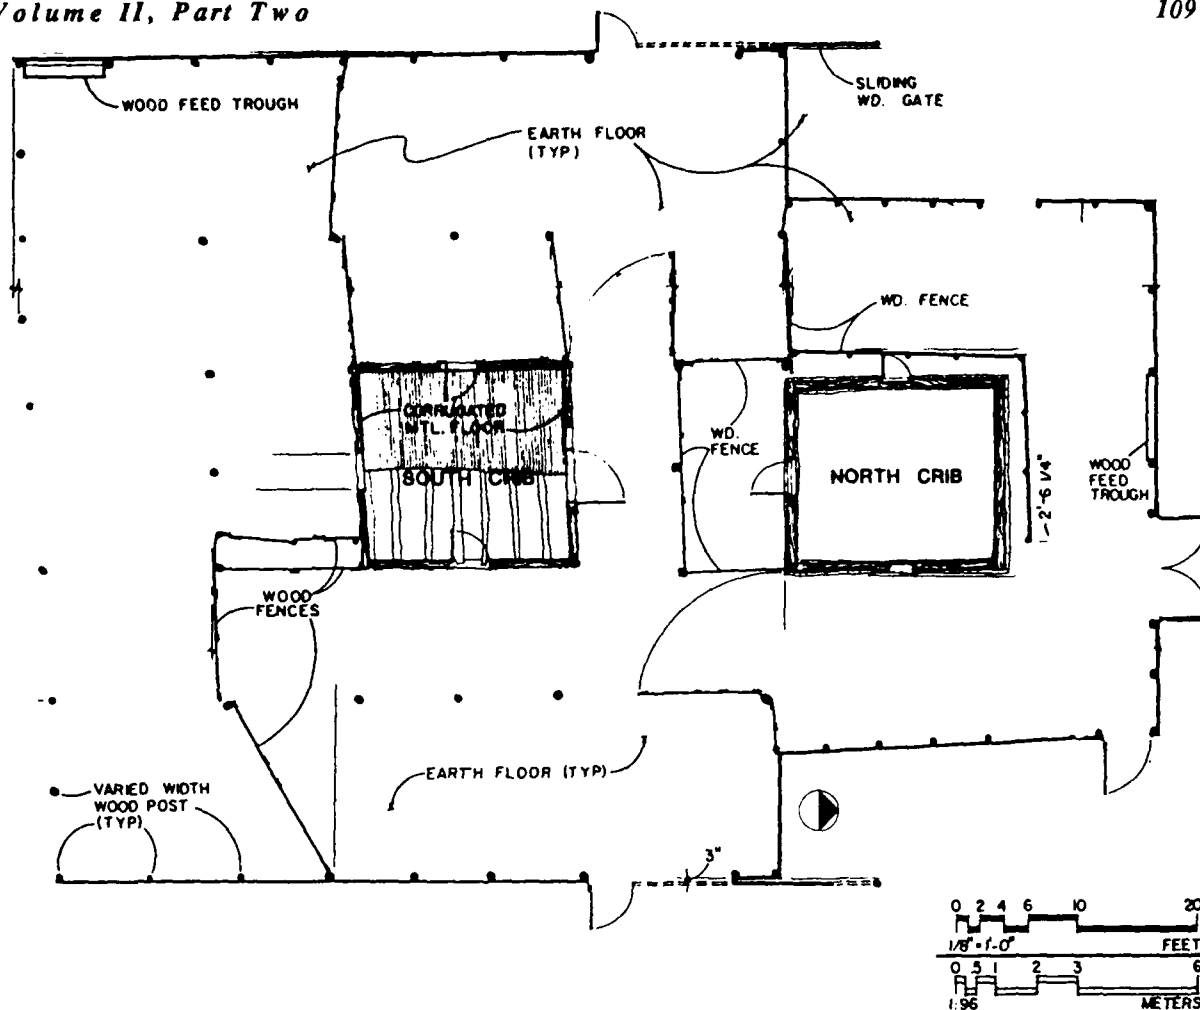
Plan view of the 1918 large frame barn (no. 8 on Figure 8-3) showing the north crib (school house) and south crib (log dwelling) HABS drawing by Stan Solamillo and Matt Karpenko for Environmental Consultants, Inc. 1982-84.
